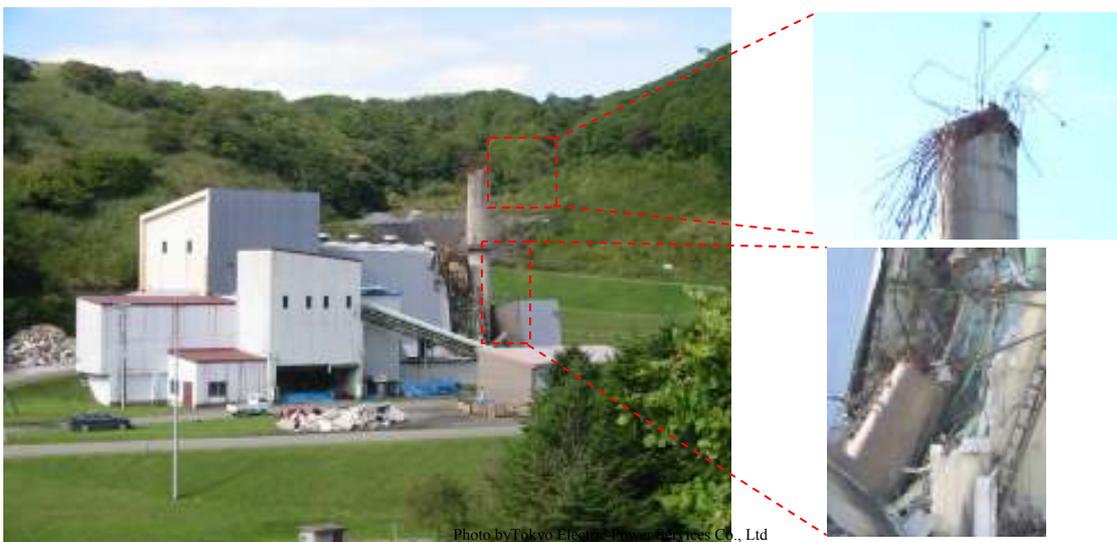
d - Collapsed chimney of garbage disposal facilities.
